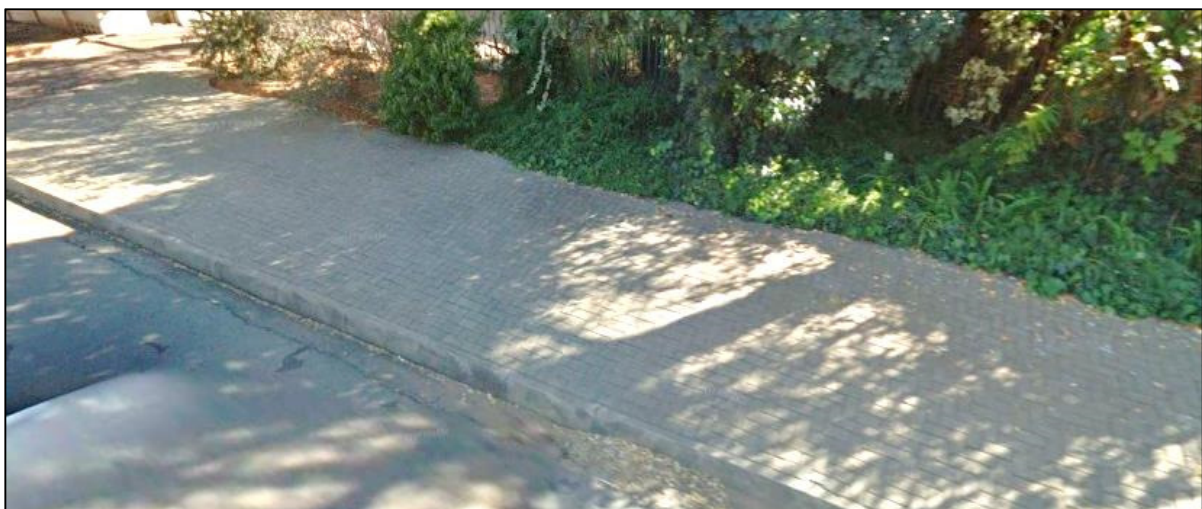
Sidewalk location 8, Christoffel Du Plessis Street, Universitas (Source: Author).
